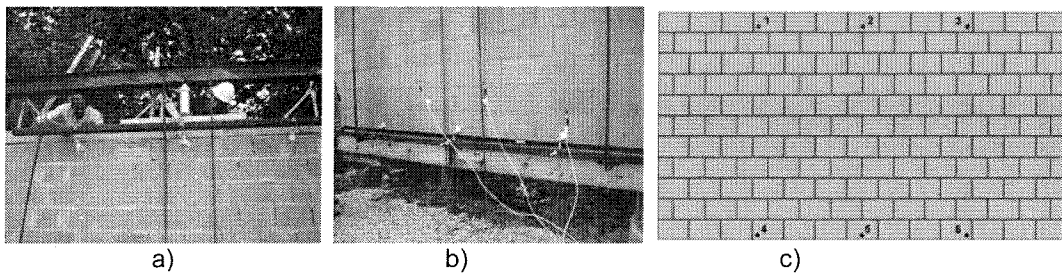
a) Superior beam used to mobilize the hydraulic jack reaction; b) Secondary structure used to hold the LVDT's; c) Reading positions.
